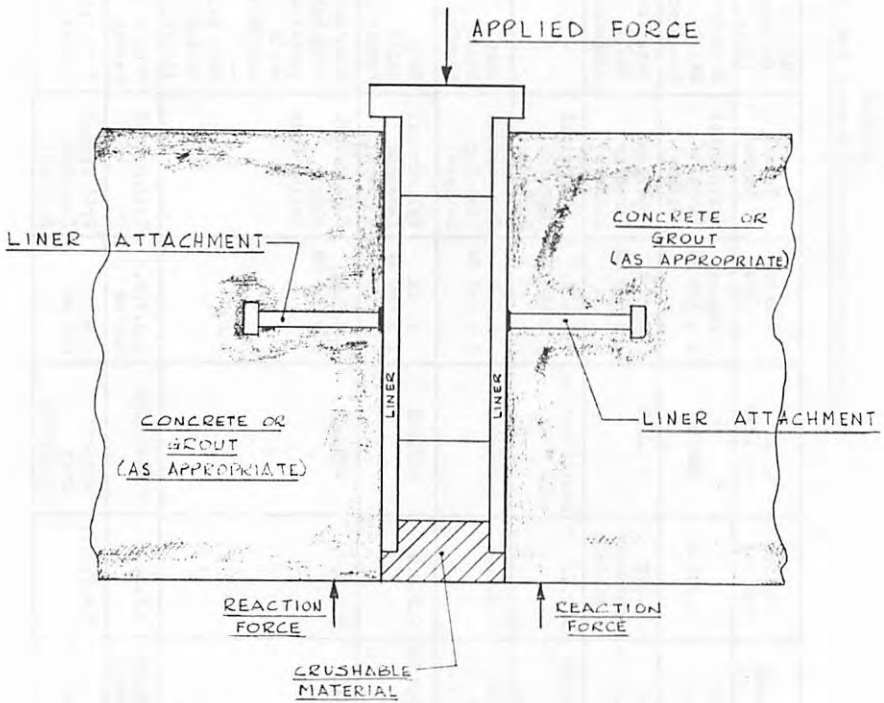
SCHEMATIC SKETCH OF LINER ATTACHMENT TEST.
